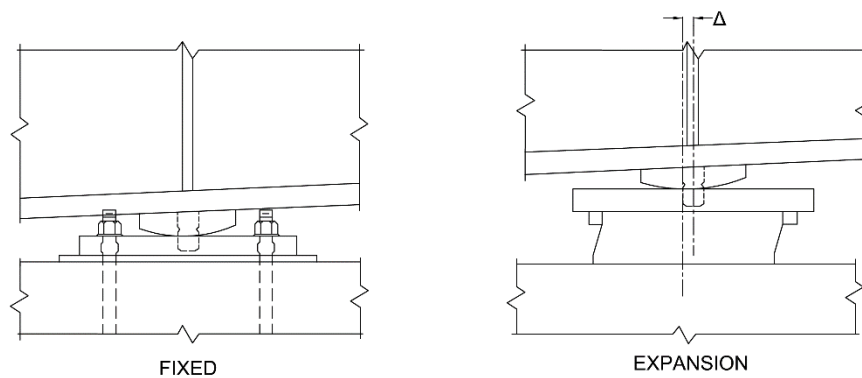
Pintle Plate & Pintle Plate with Elastomeric Pad Bearings
